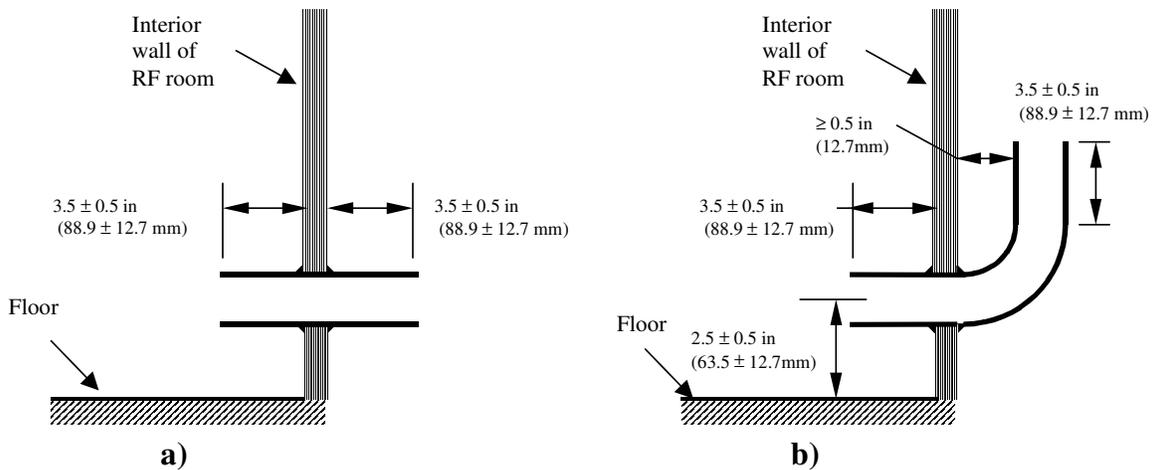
Side View of Vent Tube Penetration through RF Room Wall
